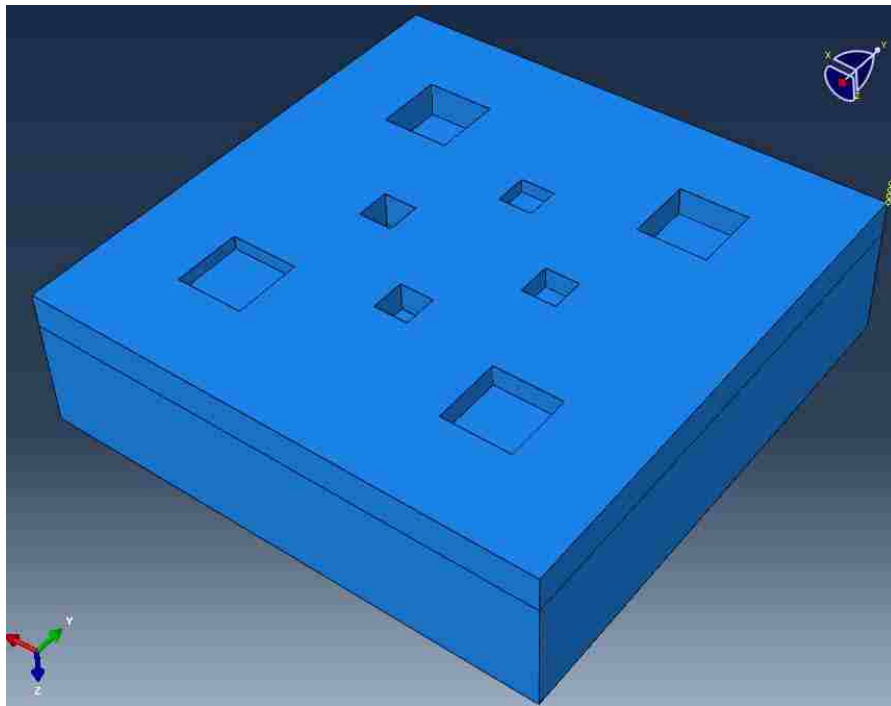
Finite element model of the concrete specimen showing the top 3 cm of the concrete remove to view of the defects
